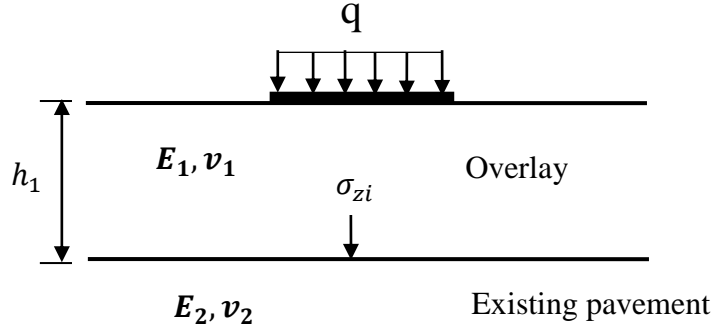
Typical flexible pavement section in a two-layered system with overlay
